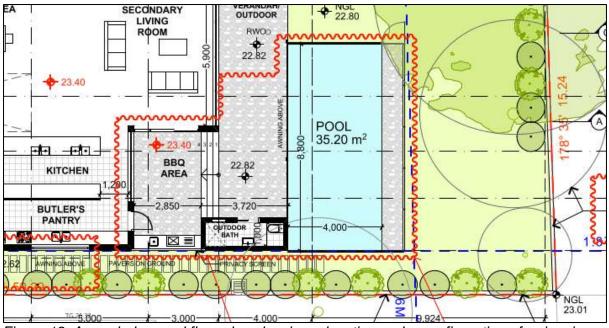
Amended ground floor plan showing relocation and reconfiguration of swimming pool and surrounding paving areas.
